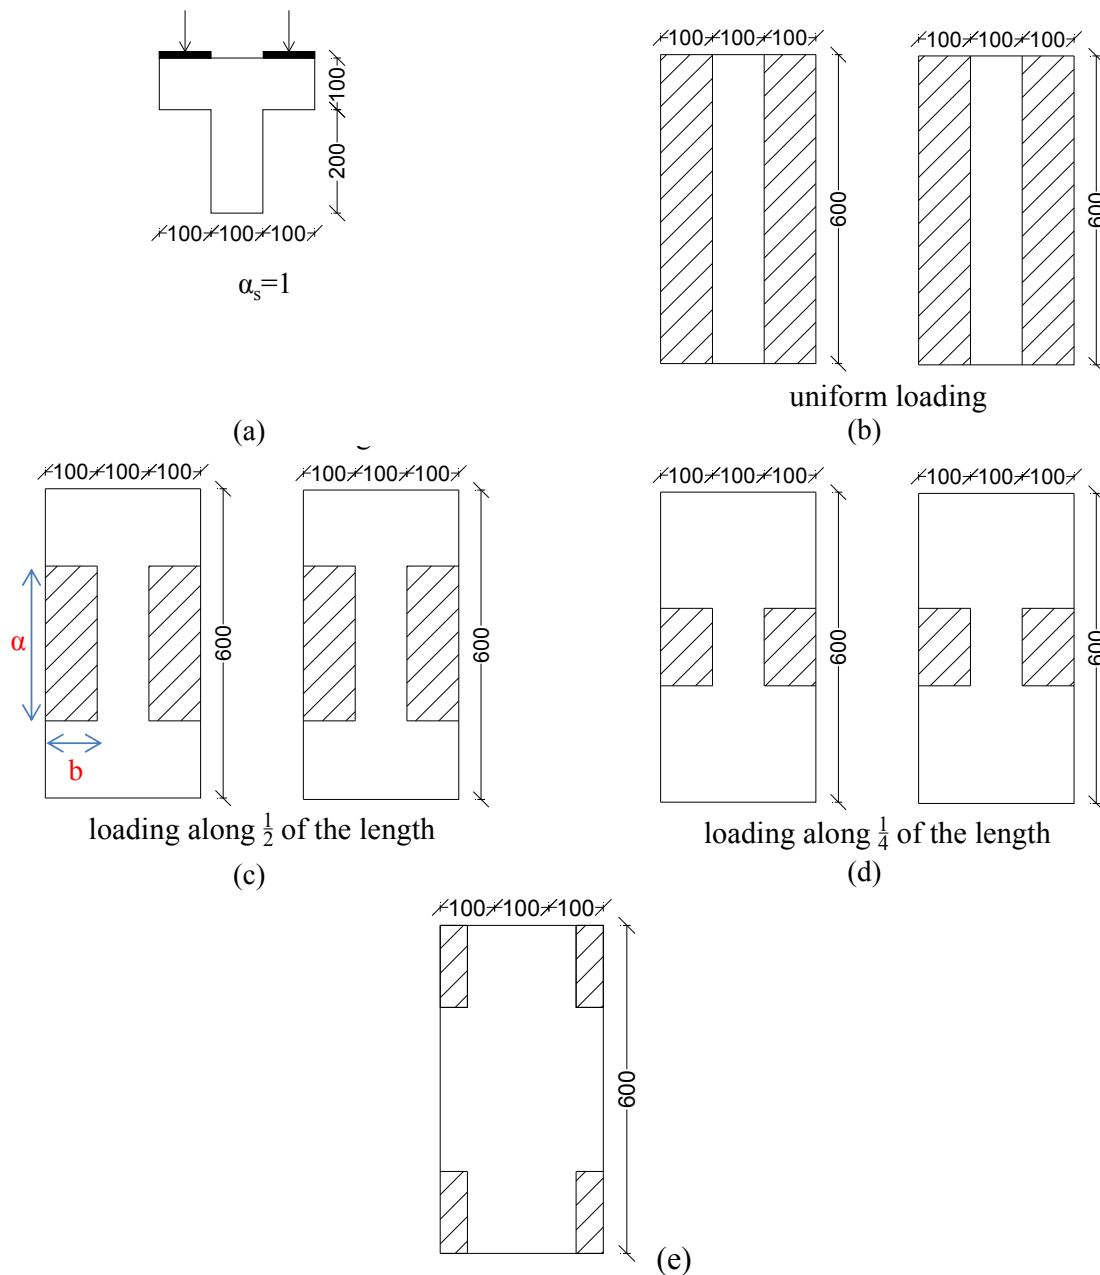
The loading of the specimens: (a) cross section of the specimen and loading; (b) uniform loading to obtain the maximum shear key capacity, (c) loading at half ($\frac{1}{2}$) of the specimen's length, distances α and b of the loading are shown in this figure, (d) loading at a quarter ($\frac{1}{4}$) of the specimen's length; (e) loading at the quarters ($\frac{1}{4} + \frac{1}{4}$) ends of the specimen.
